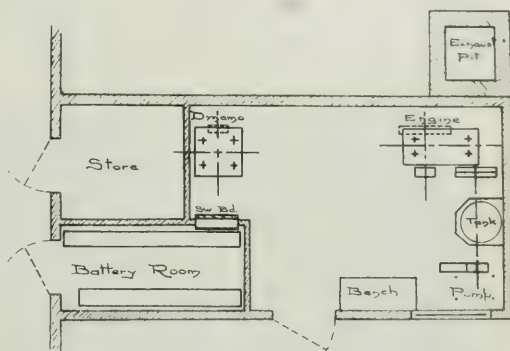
PLAN OF EXISTING BUILDING UTILISED FOR ELECTRIC AND PUMPING PLANT
